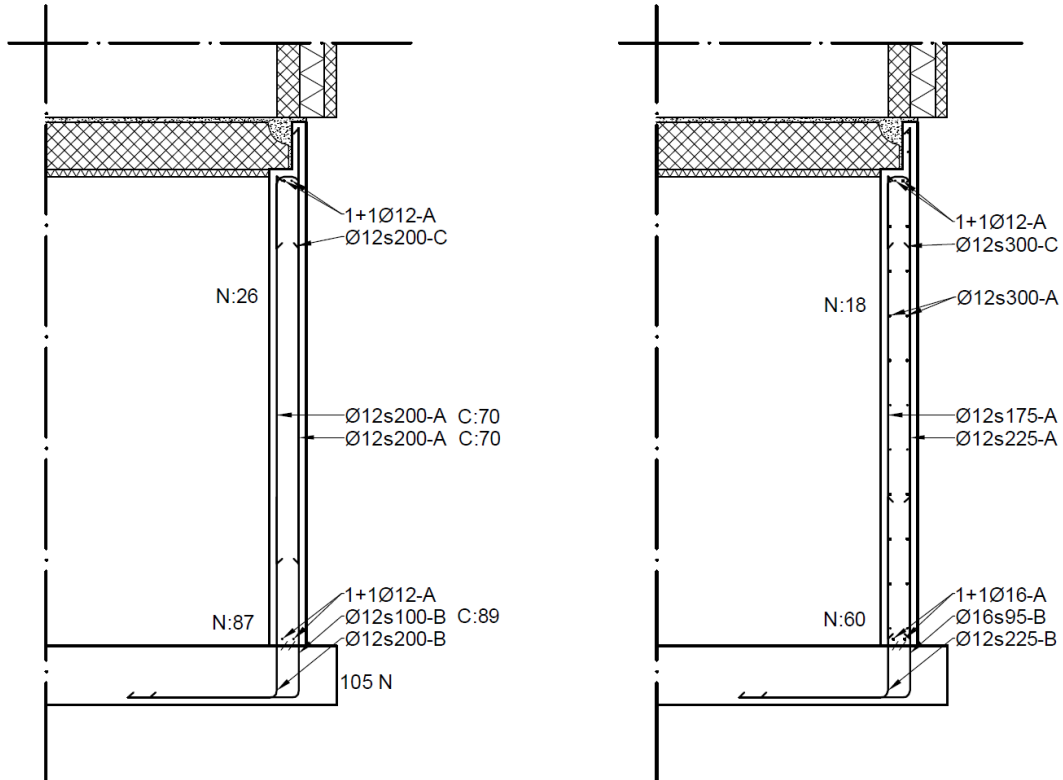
Wall reinforcement for CFRP with regard to requirements in ULS (left) and SLS (right)
